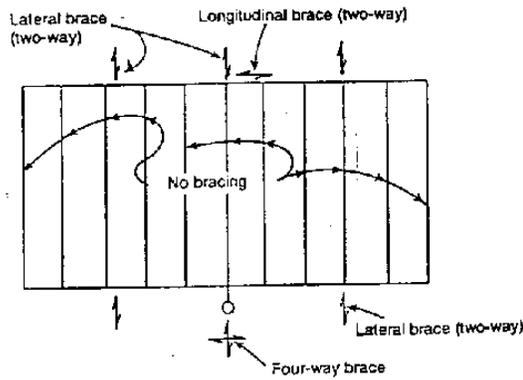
(c) Typical location of bracing on a gridded system.
